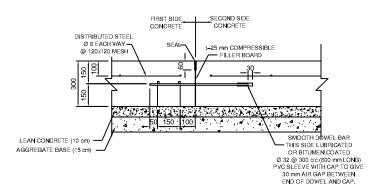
# DETAIL OF CONTRACTION JOINT FOR RGID PAVEMENT
